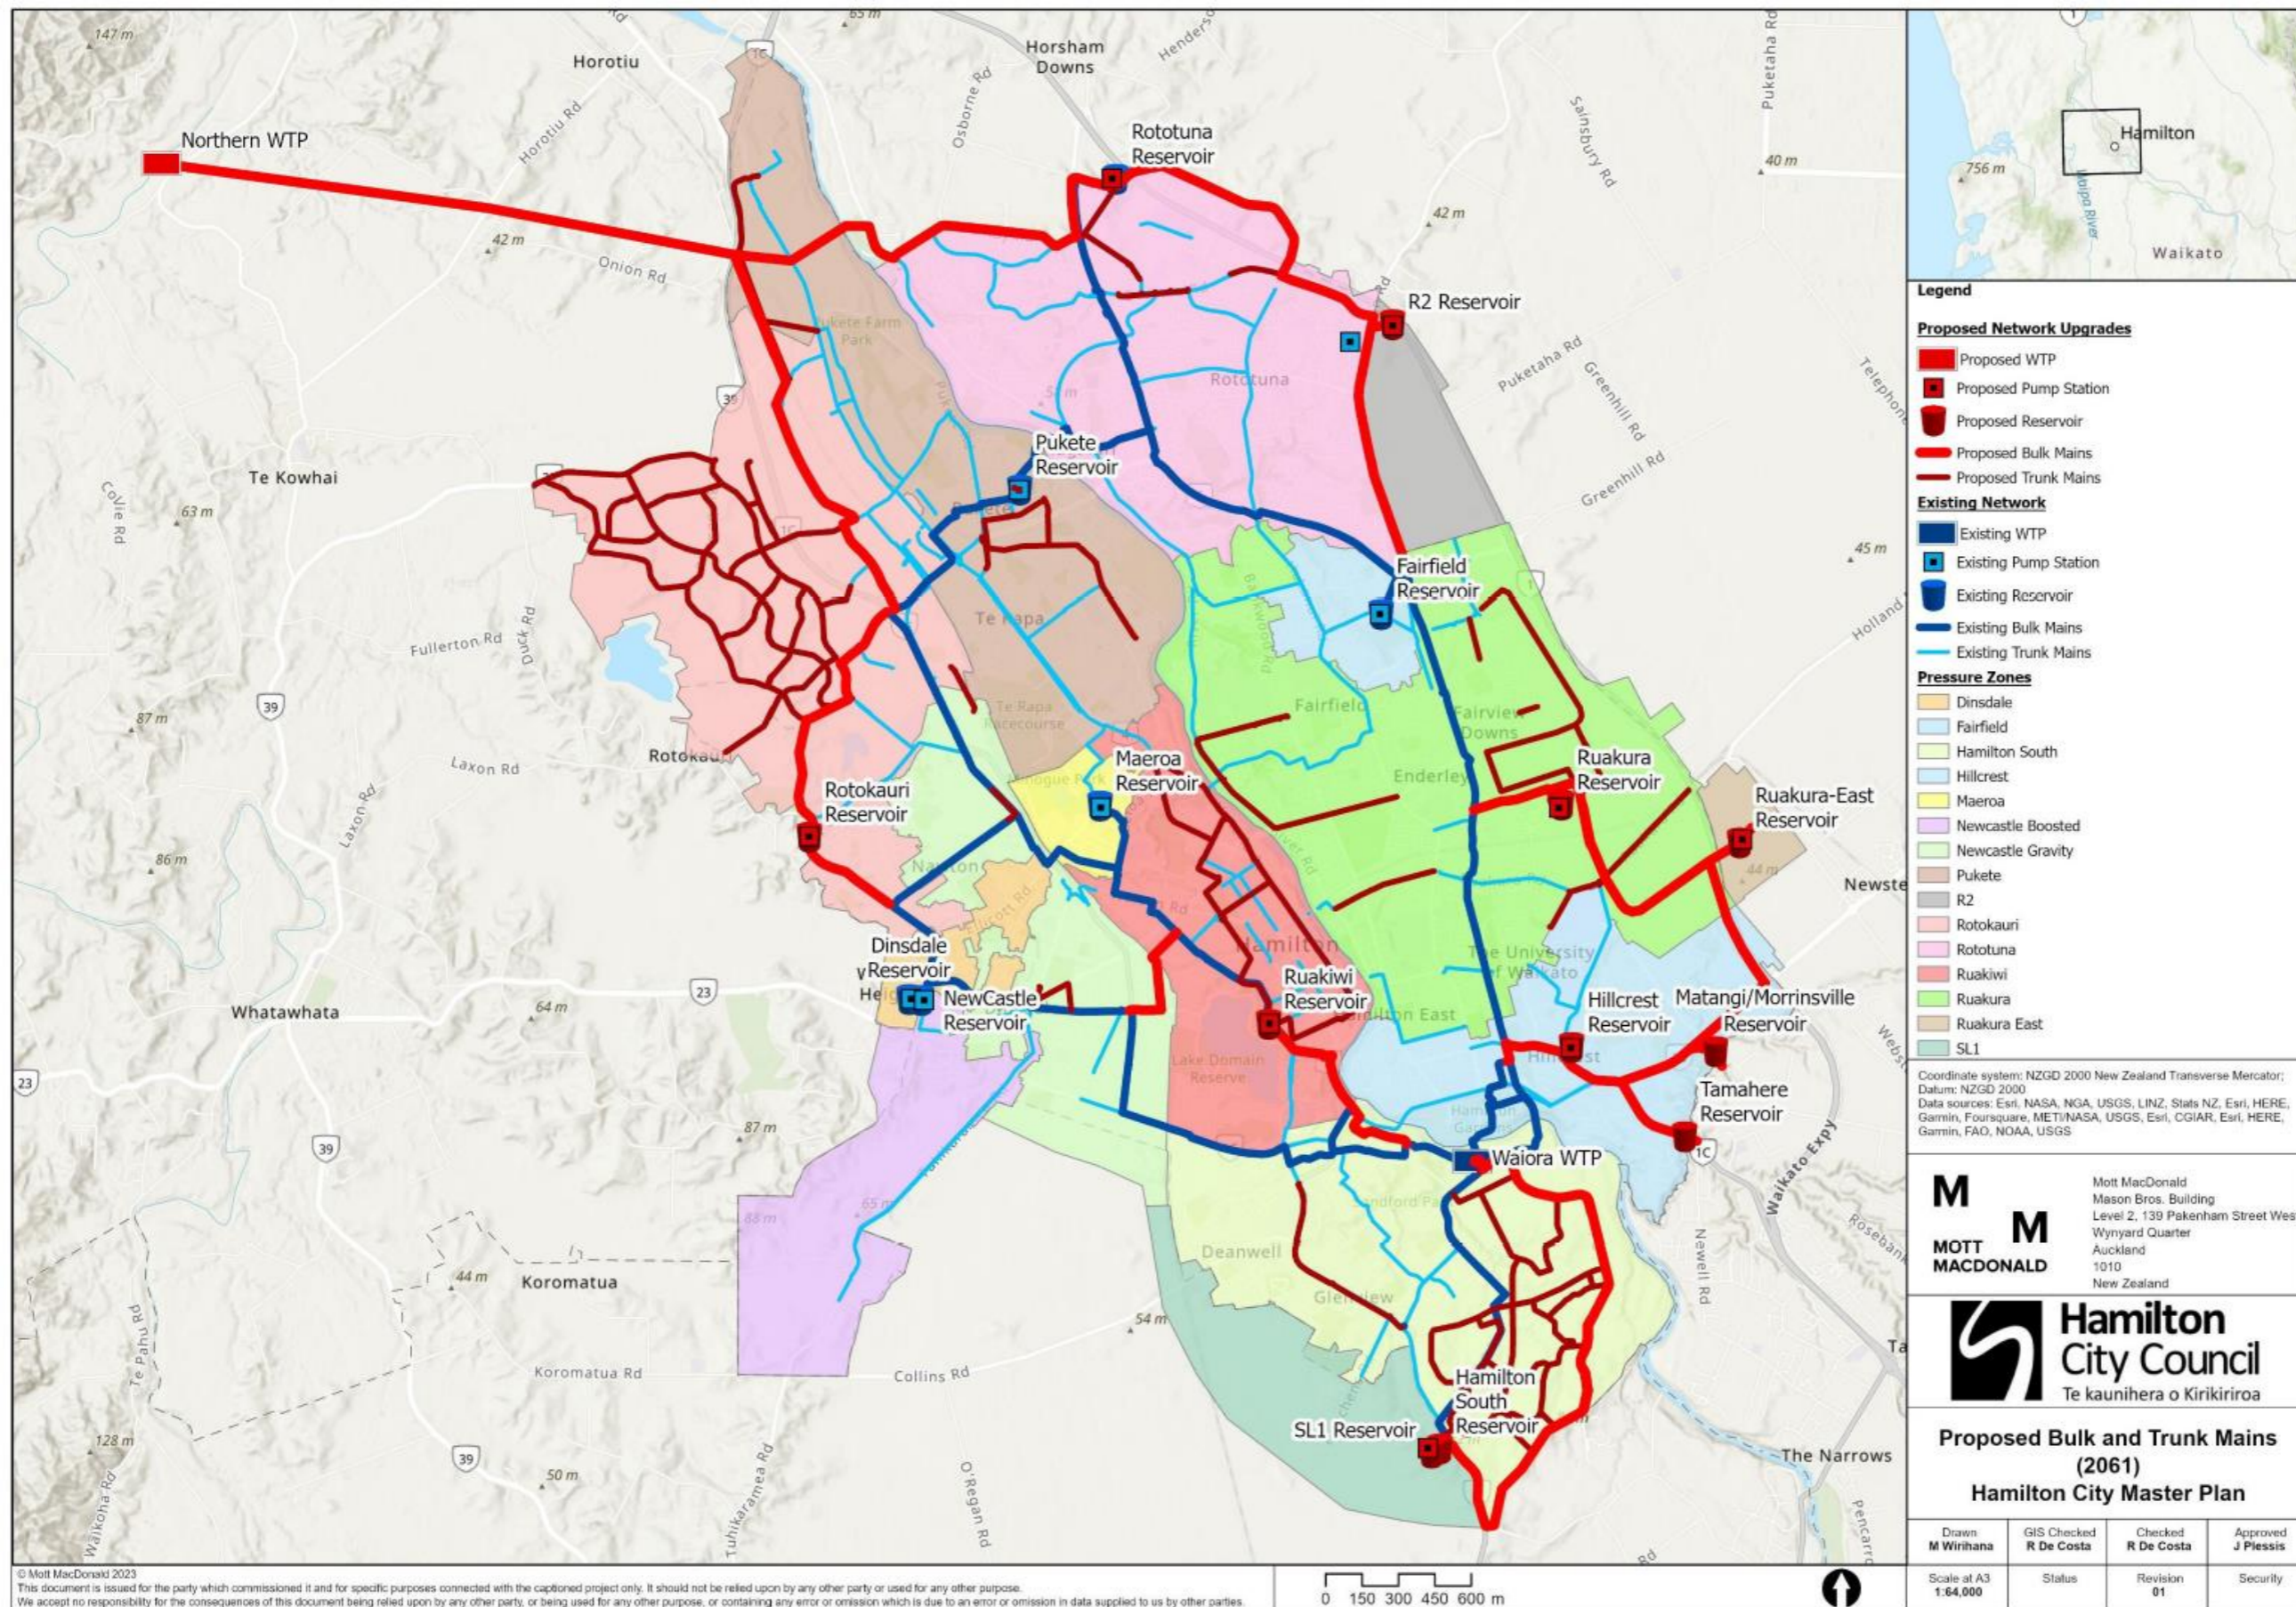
Proposed strategic WS infrastructure – 2061 planning horizon. Trunk main alignment in Te Rapa North is below bulk main alignment.
